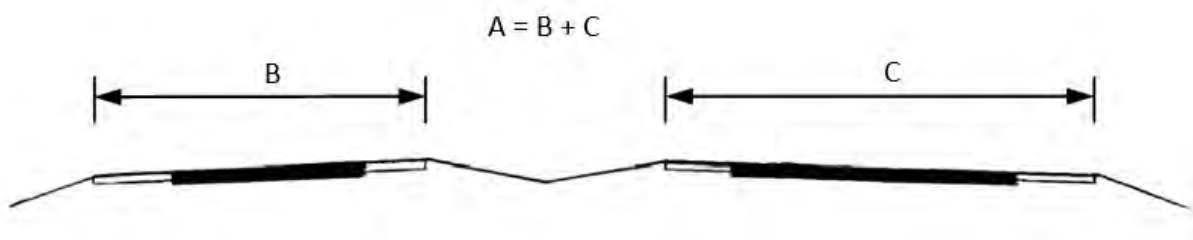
Cross-section view of two approach roadways that are carried across one structure
